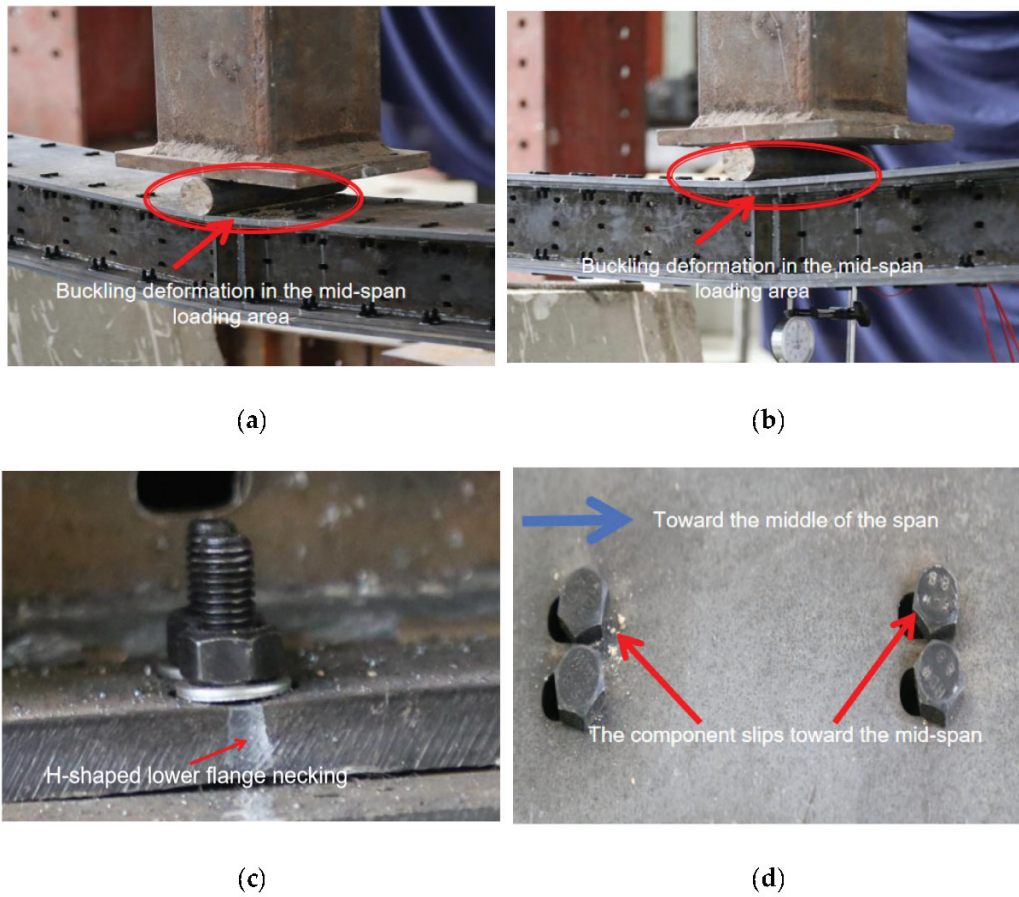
Failure mode of specimens (FF-L); (a) BL15 × 9-HL15 × 9; (b) BC9-HL15 × 9; (c) H-beam lower flange necking failure; (d) relative slippage between components.
